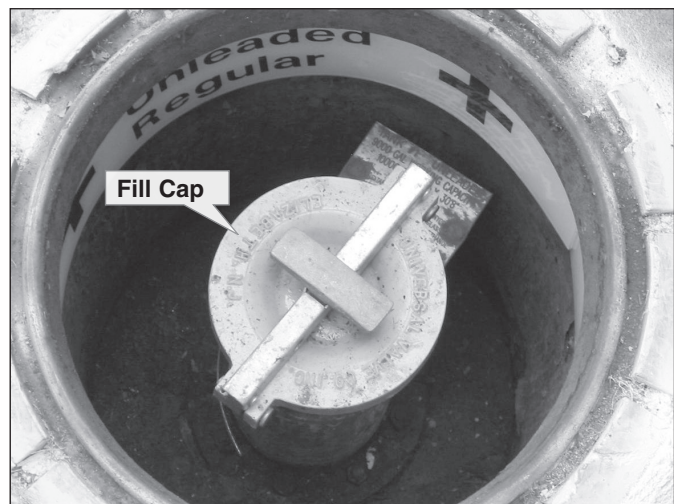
Fill caps should be in good condition and seat tightly on the fill pipe to prevent the escape of vapors.
